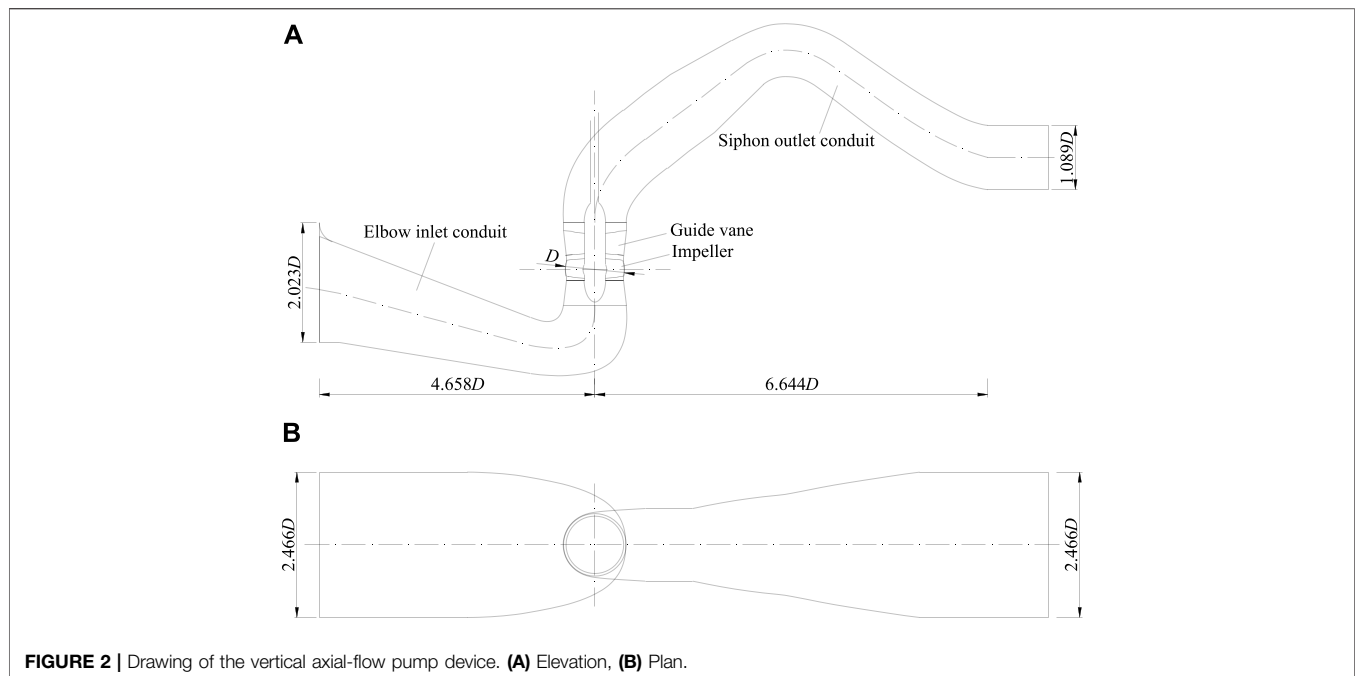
| Drawing of the vertical axial-flow pump device. (A) Elevation, (B) Plan.
